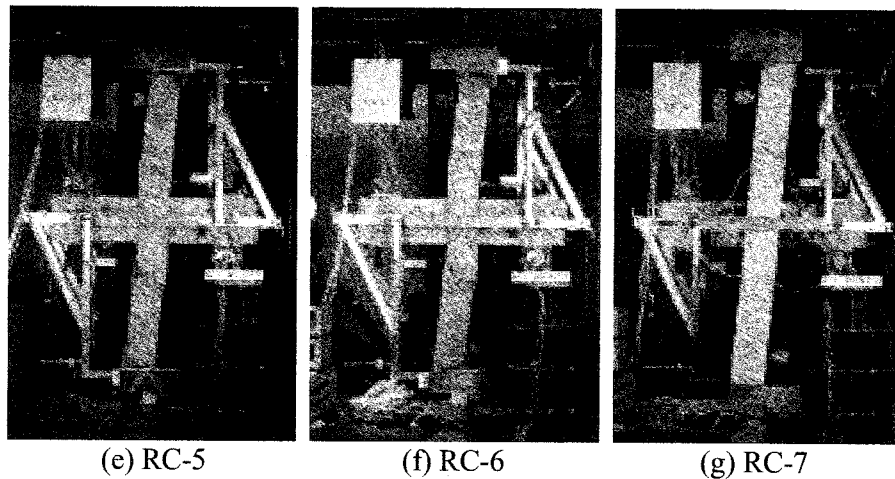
Picture of Eccentric Type Specimens at Maximum Deformation
